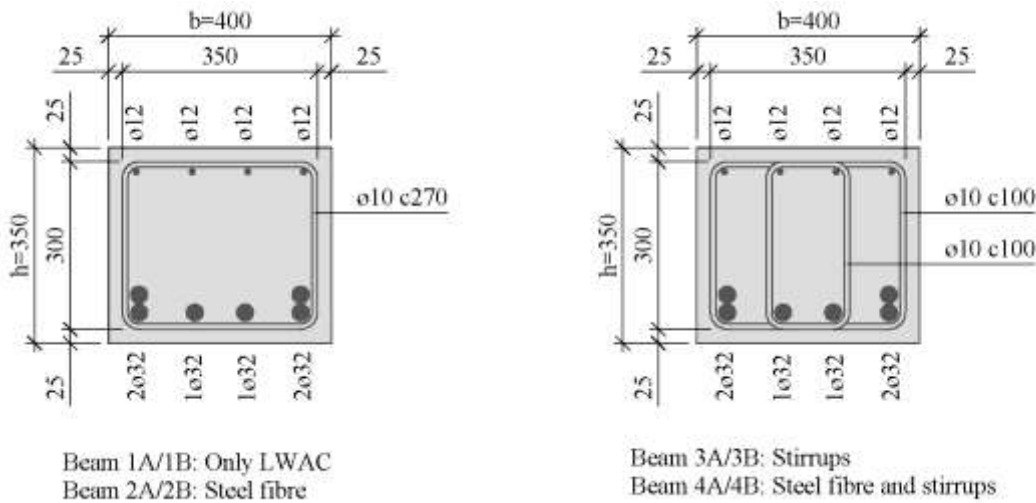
Reinforcement layout at mid span and dimensions (in mm)
